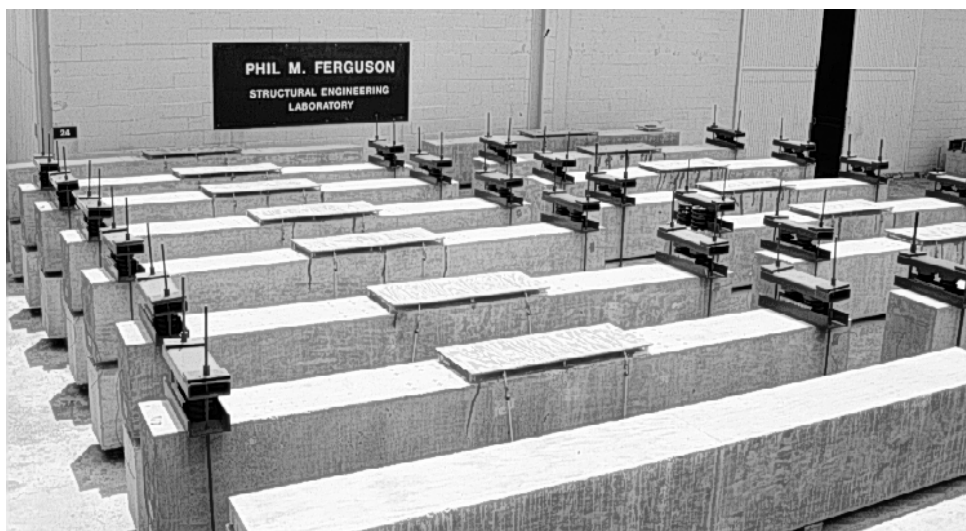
Top View of Beams Showing Ponded Area (Covered)
